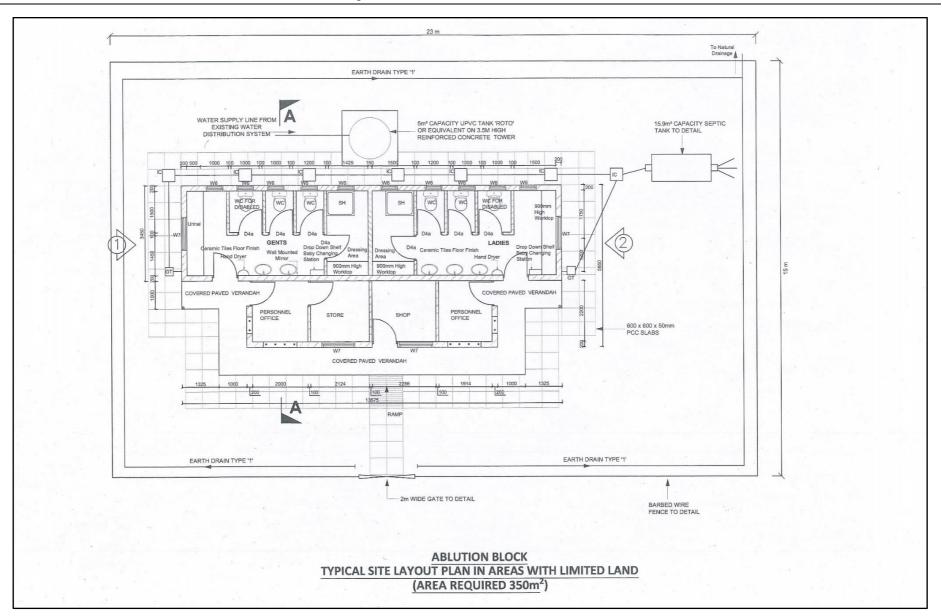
Typical Site Layout Plan for an Ablution Block
